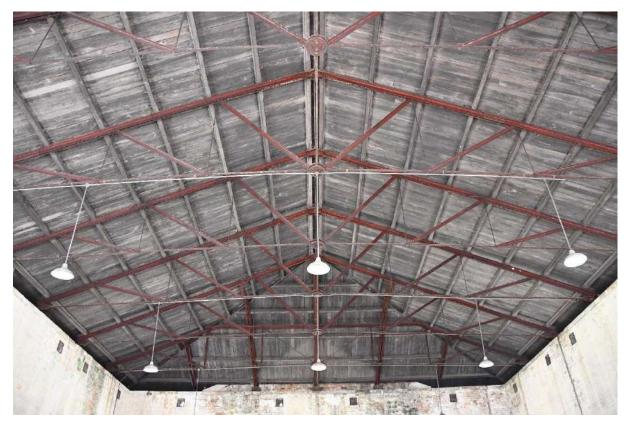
Internal view of the roof of the Main Pumphouse showing the roof trusses and water damaged walls.
